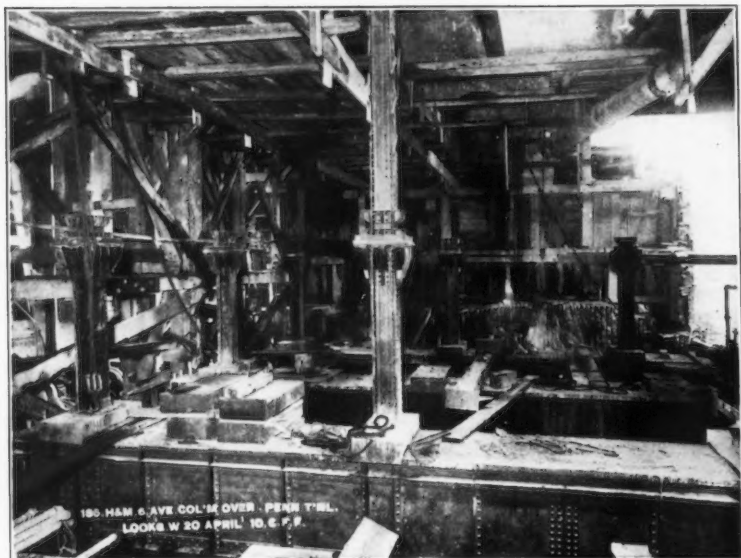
STEEL CROSSING OF PENNSYLVANIA RAILROAD TUNNEL.
